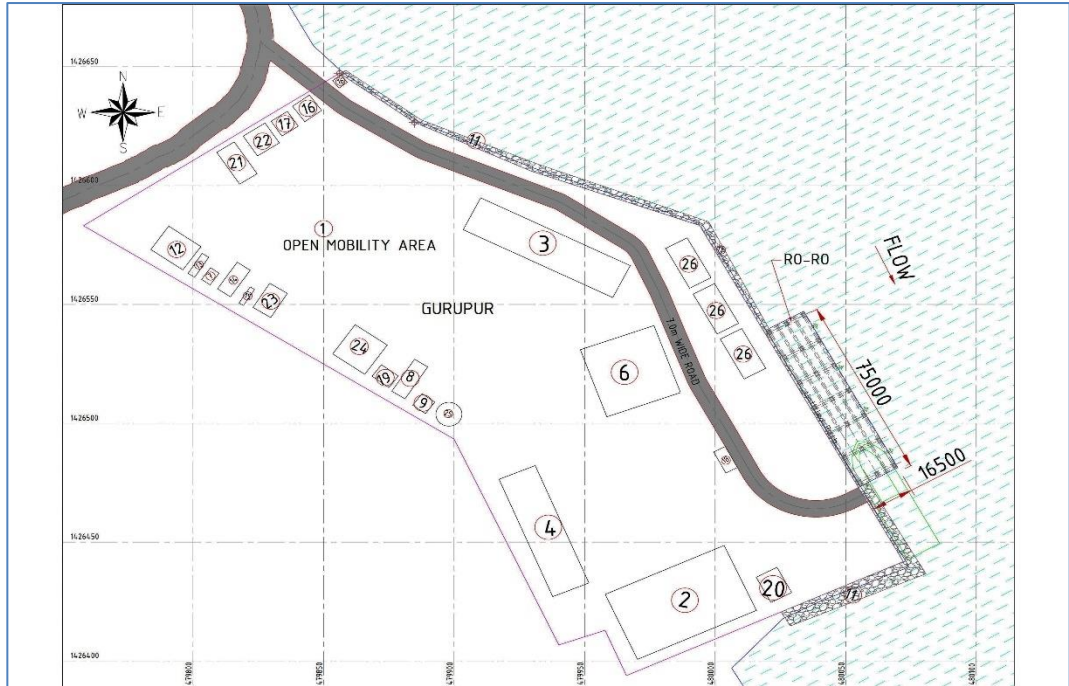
Site Layout plan of proposed Ro-Ro terminal (A) at Ashok Nagar (Gurupur)
